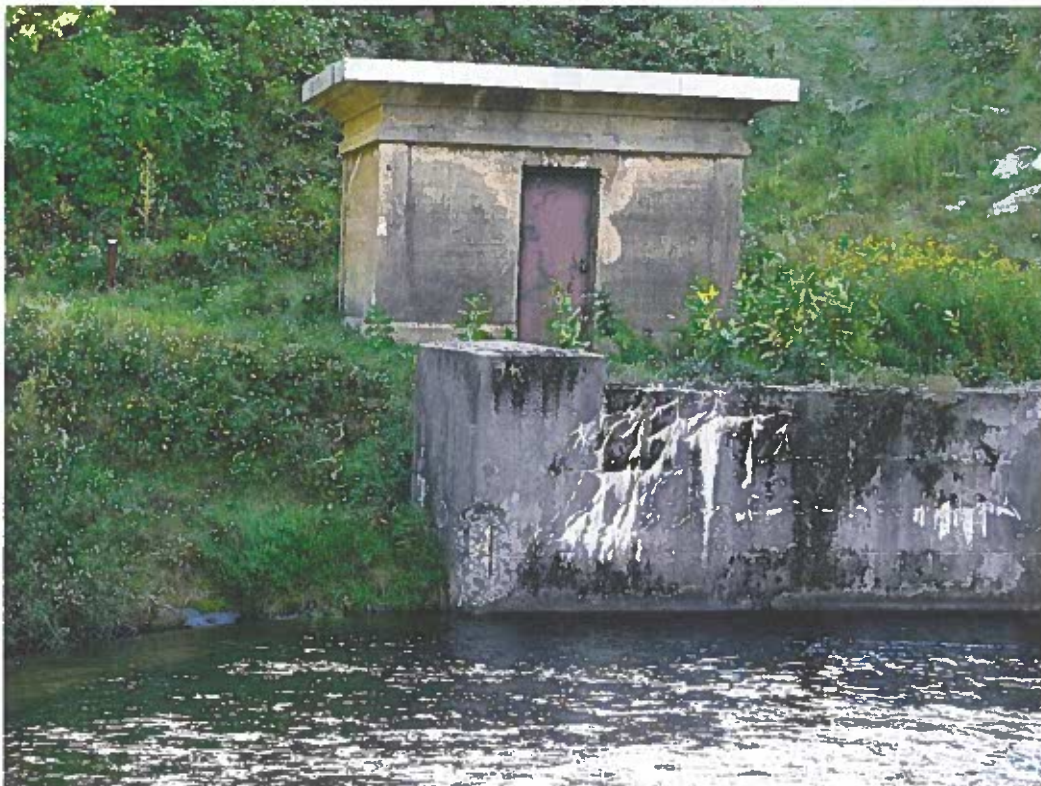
Concrete spalling and exposed rebar at the end of the right training wall.
